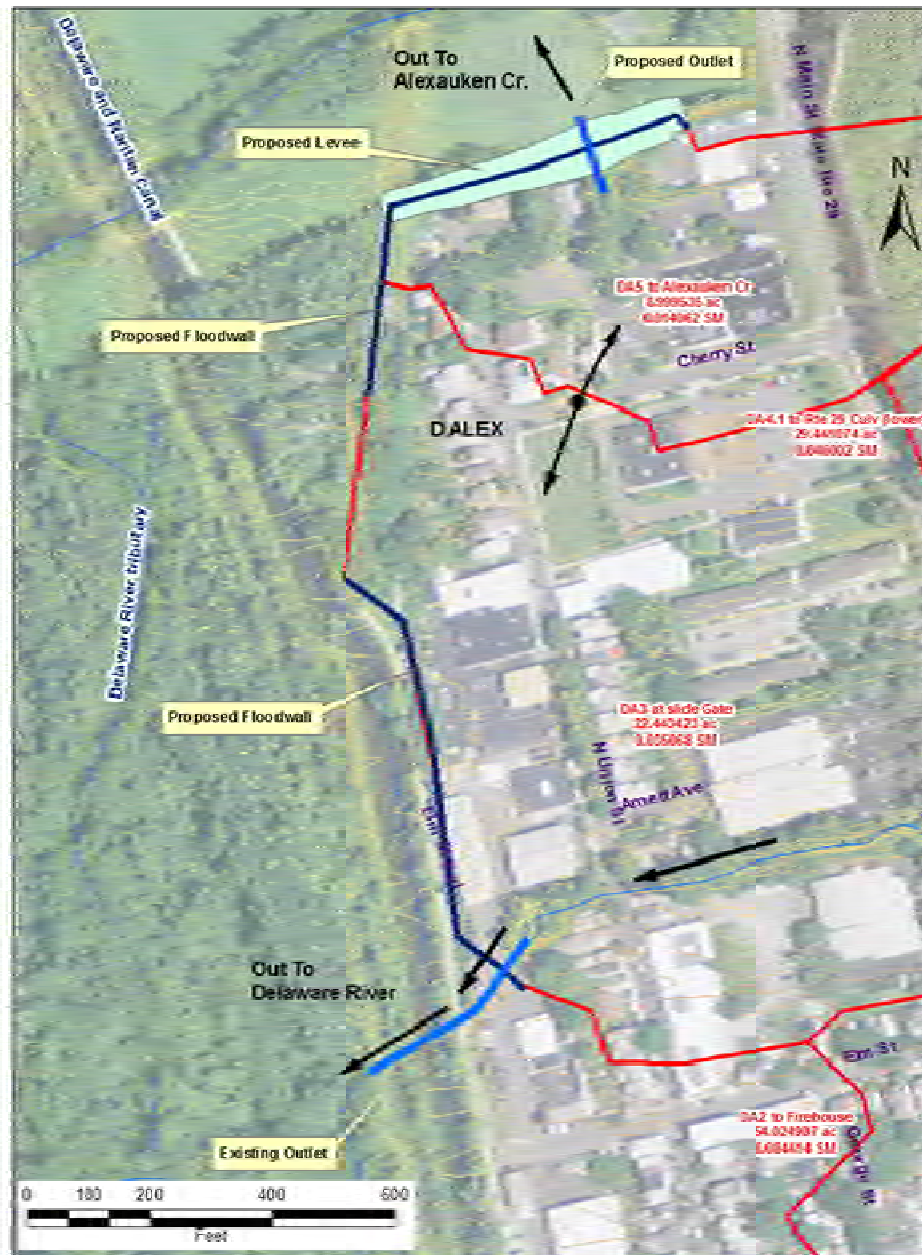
Lambertville Minimum Facilities Interior Drainage
